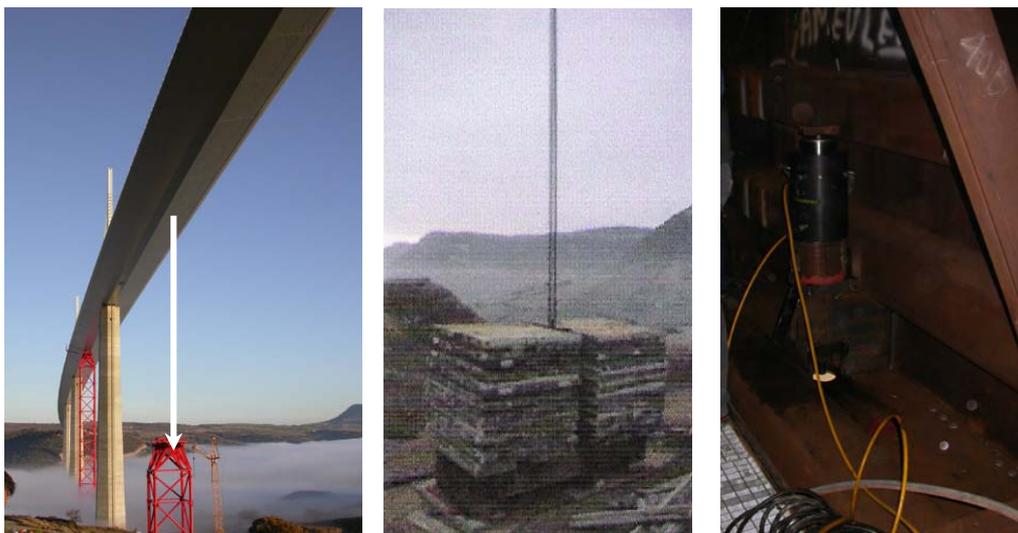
Free vibration test: tensioned cable, cut from inside the box girder
